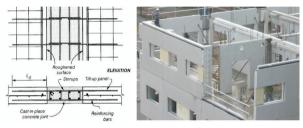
Vertical connection detail Figure 35. Vertical connections between internal walls
